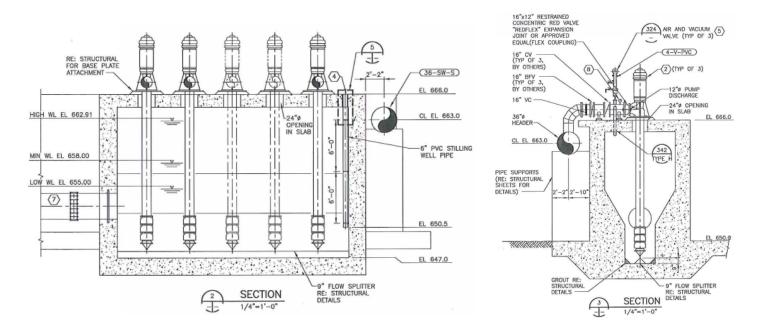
Section Views of Midlothian Water Treatment Plant Trench-Type Wet Well Pump Station
